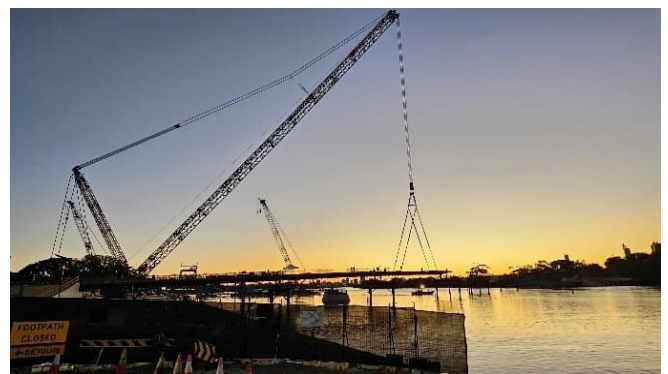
1600-ton crawler crane lifting segment 5 of McCallum Park Bridge
